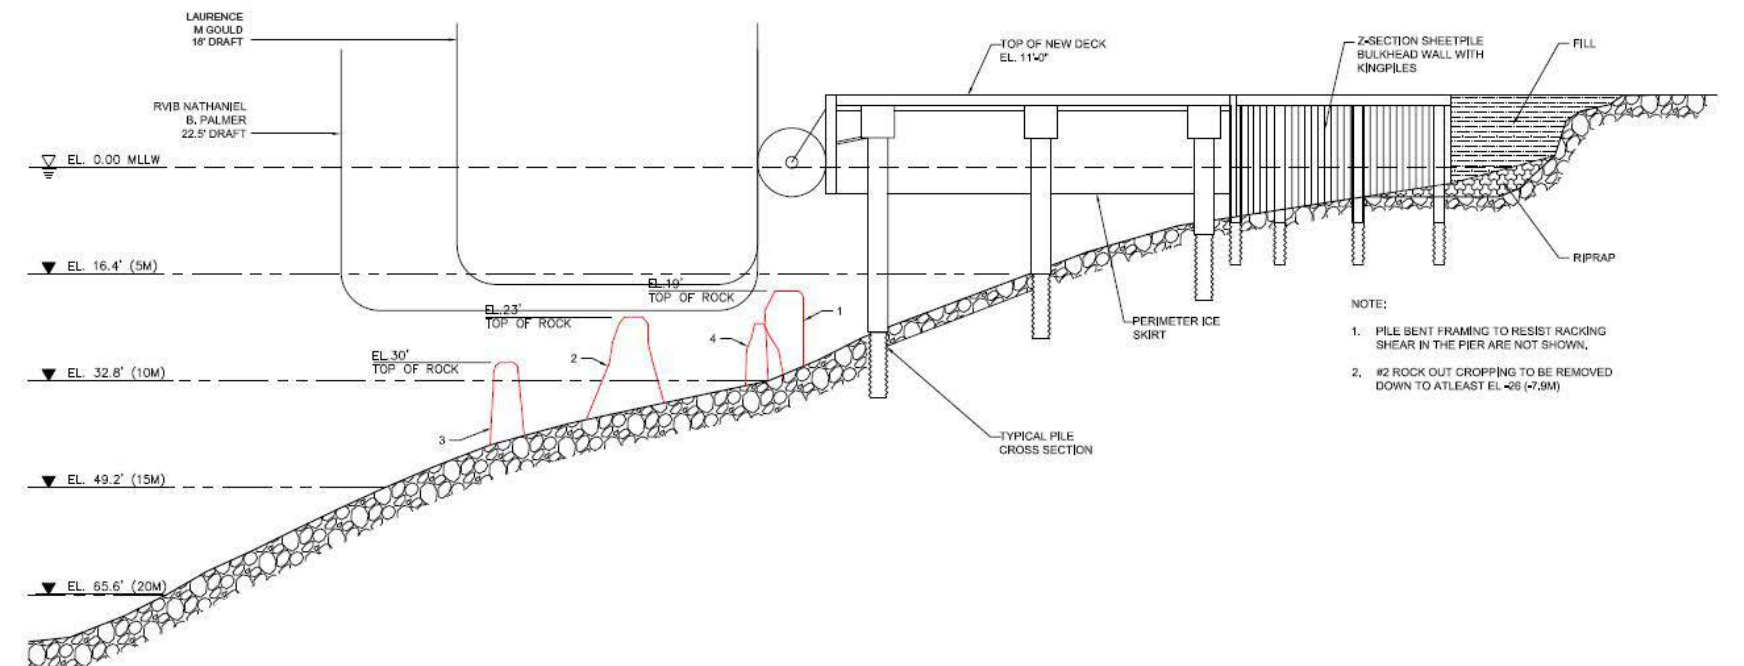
Representative Cross-Section View of a Possible Pile Pier – Bulkhead Pier Hybrid
